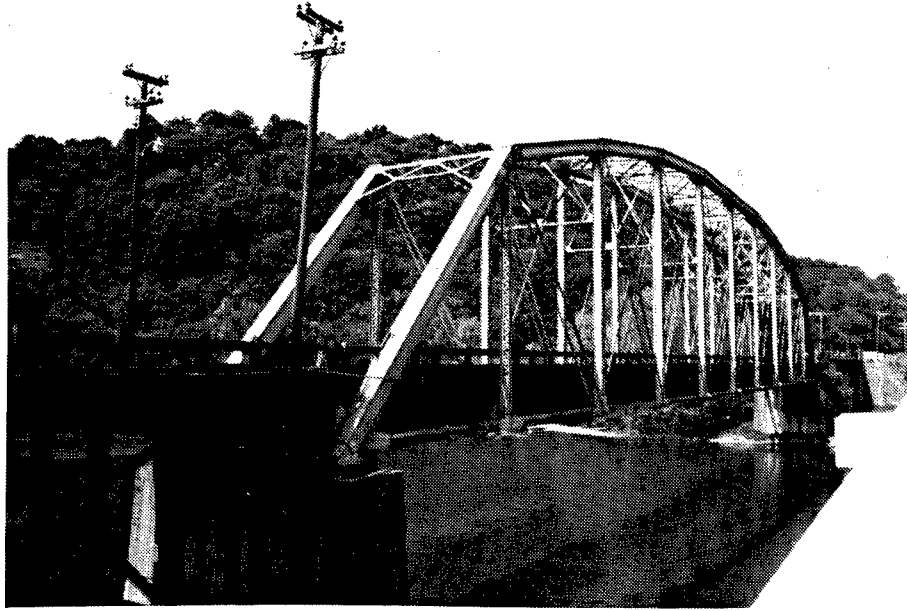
Railroad bridge, shown crossing the Holston River, into Magazine Area.
